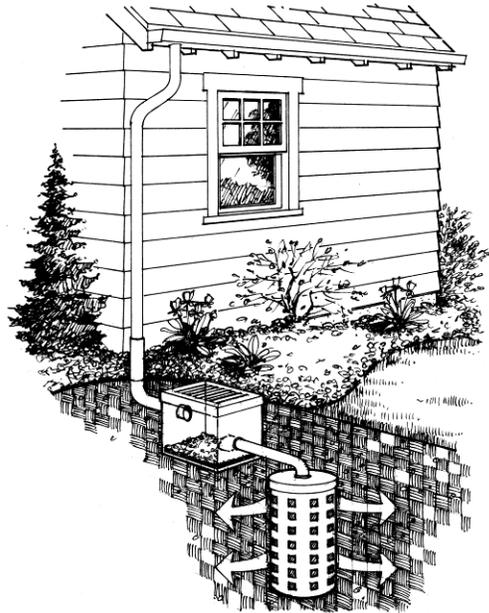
Drywell illustration. See [Appendix G.1](#), SW-170, for typical drywell details.
